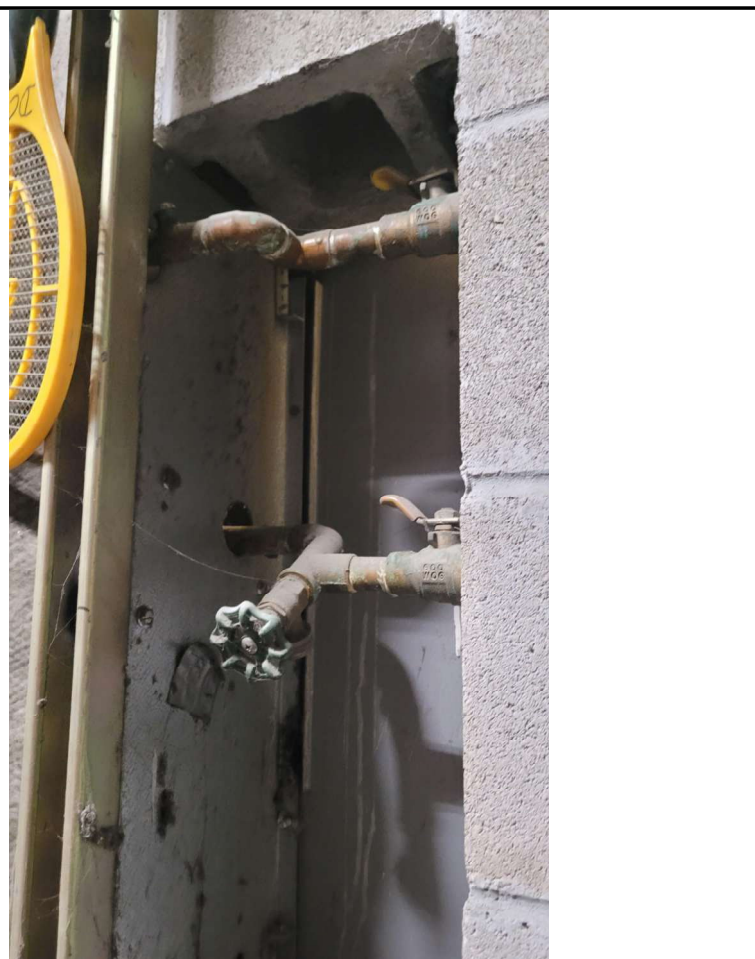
EXISTING CABINET UNIT HEATER HOT WATER PIPING IN ELEVATOR MACHINE ROOM
